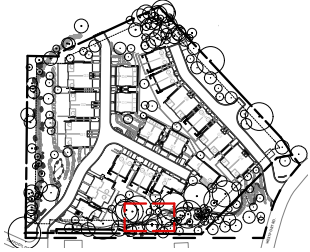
DETAIL PLAN: WESTPORT RD. ENTRY PLANTING CONCEPT
